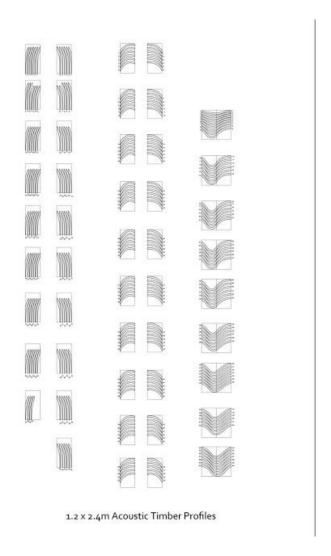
The Interior's Timbers Arrangement of Cave Restaurant (Source: http://housevariety.blogspot.my)
